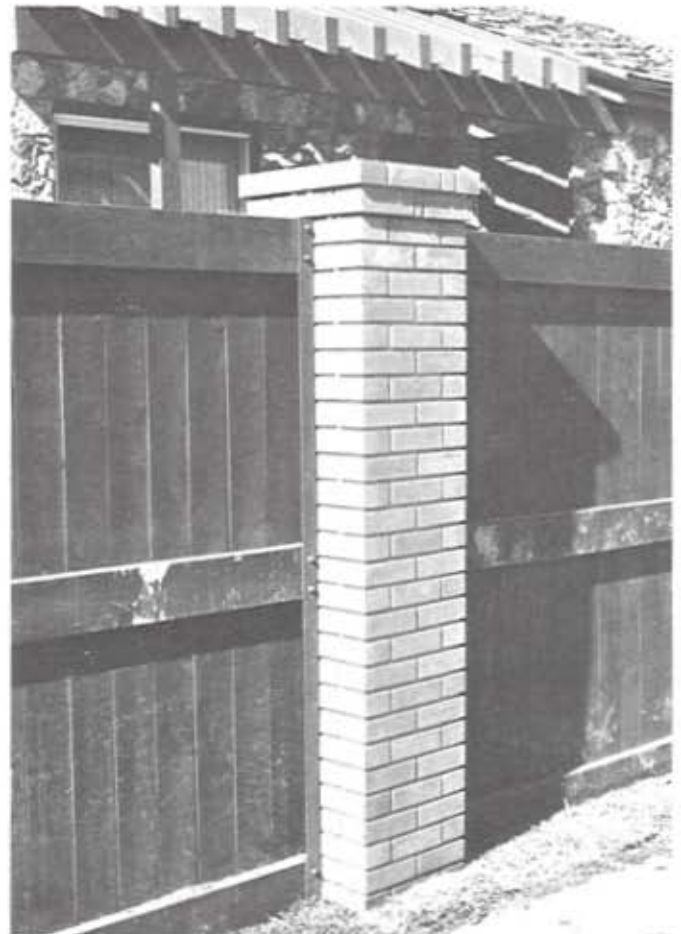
Brick pillars may be placed between wooden fence panels to produce a solid and attractive, though somewhat expensive, combination fence and wall.
